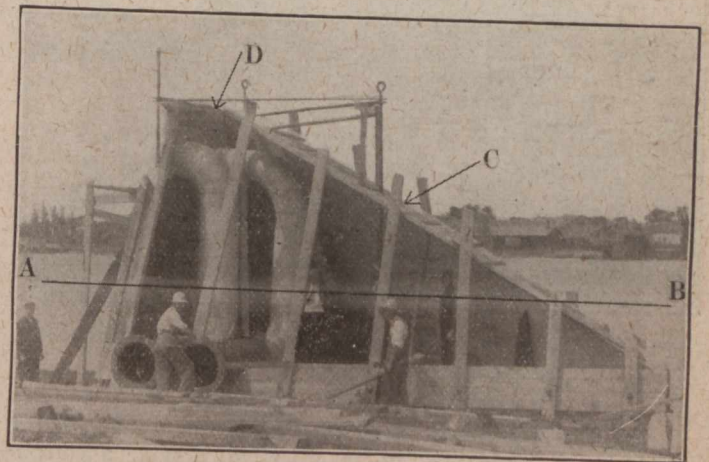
SIDE VIEW OF INTAKE STRUCTURE, WITH PIPES IN PLACE
